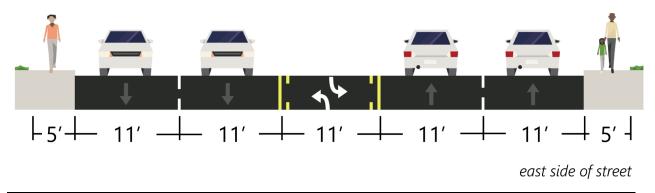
Typical Cross Section Segment 2: Mill Plain Boulevard to NE 9th Street (looking north)
